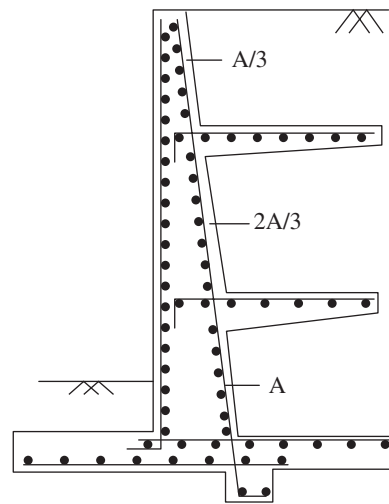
Cantilever-retaining walls with relieving platforms
